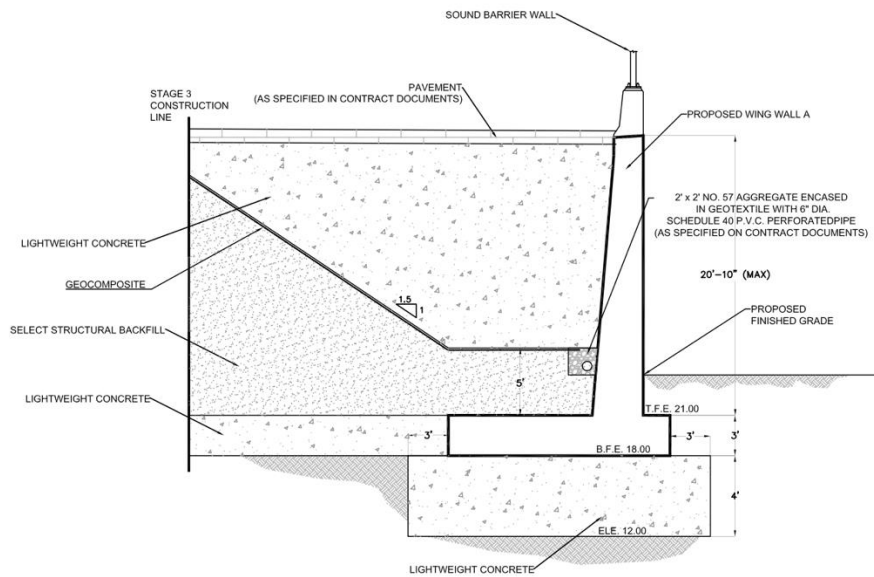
Typical cross section for Wingwall D (0095 Over Marlborough Street, S-26901).
